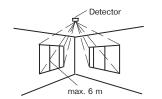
Installing the Detector on the Ceiling (for window openings in the neighboring walls monitoring)
